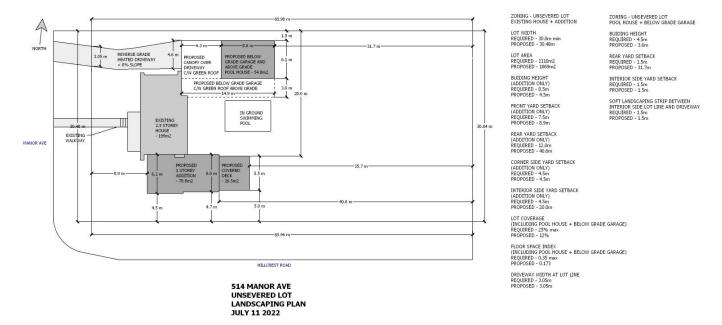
Site plan with zoning specifications illustrating the new addition, below grade garage, pool, and pool house within the unsevered lot. Source: revised site plan Design Valley 2022
